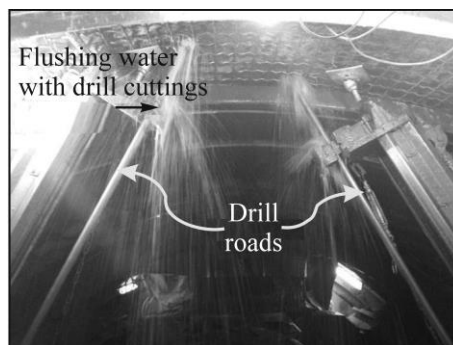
A view of Sandvick Power Pack HP555, hydraulic rotary percussive drill machine working at NJHPP.
